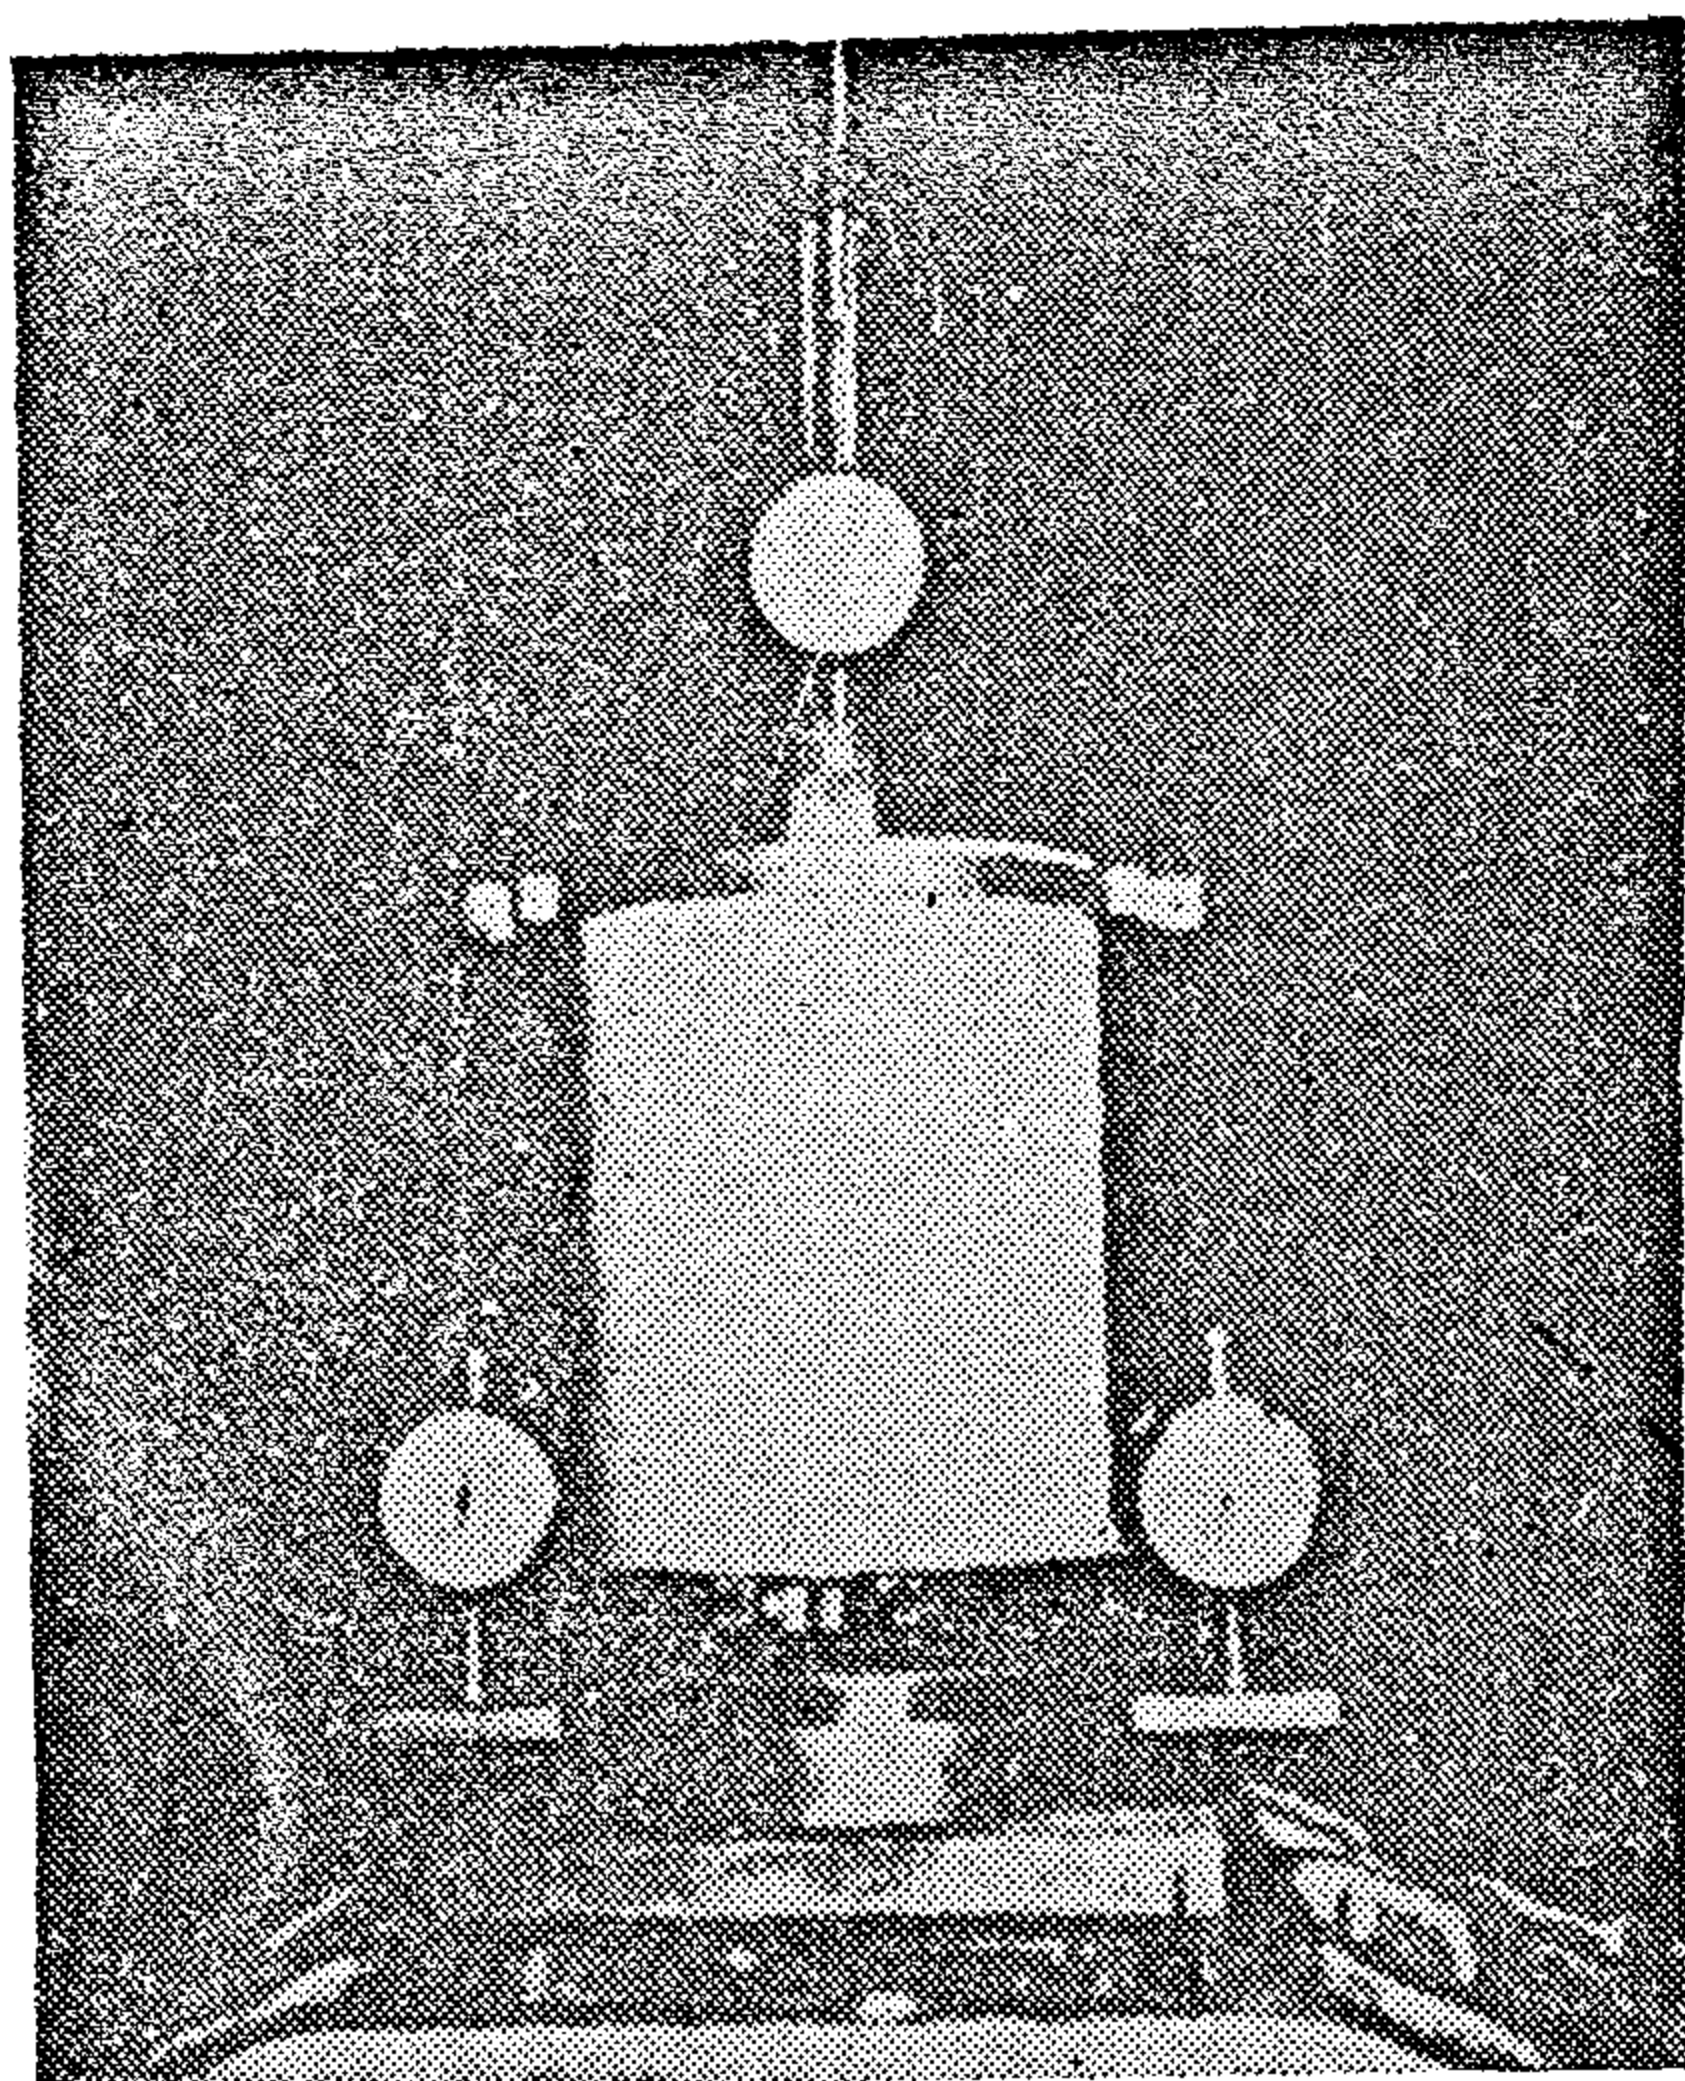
Loading Arrangement and Instrumentation For Pull-out Test.
